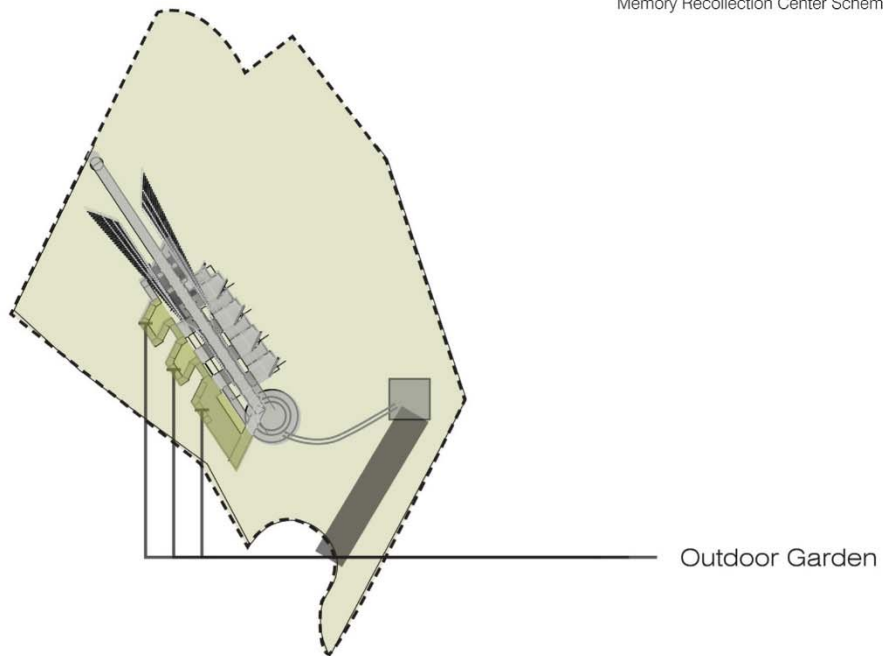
Design Approach 1 Outdoor Garden Diagram. Made by Author.
